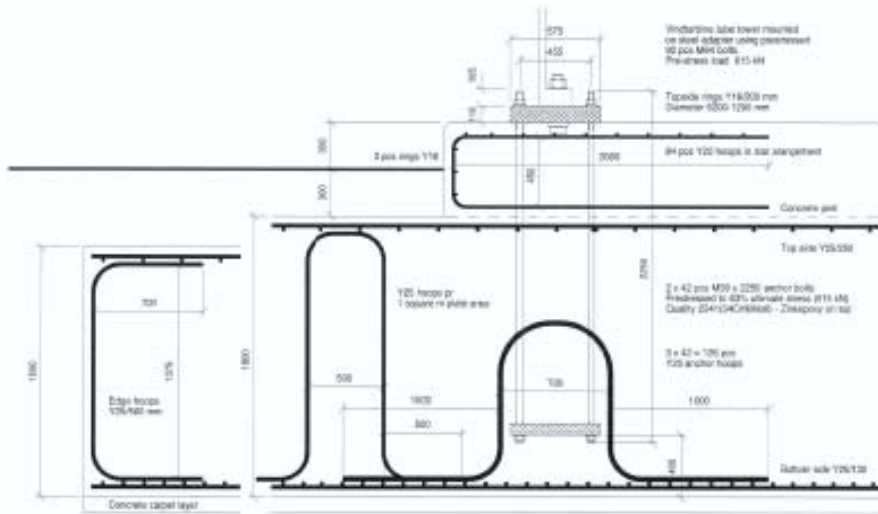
Steel adapter, anchor bolts with lower flange placed over the reinforcement, [10].
